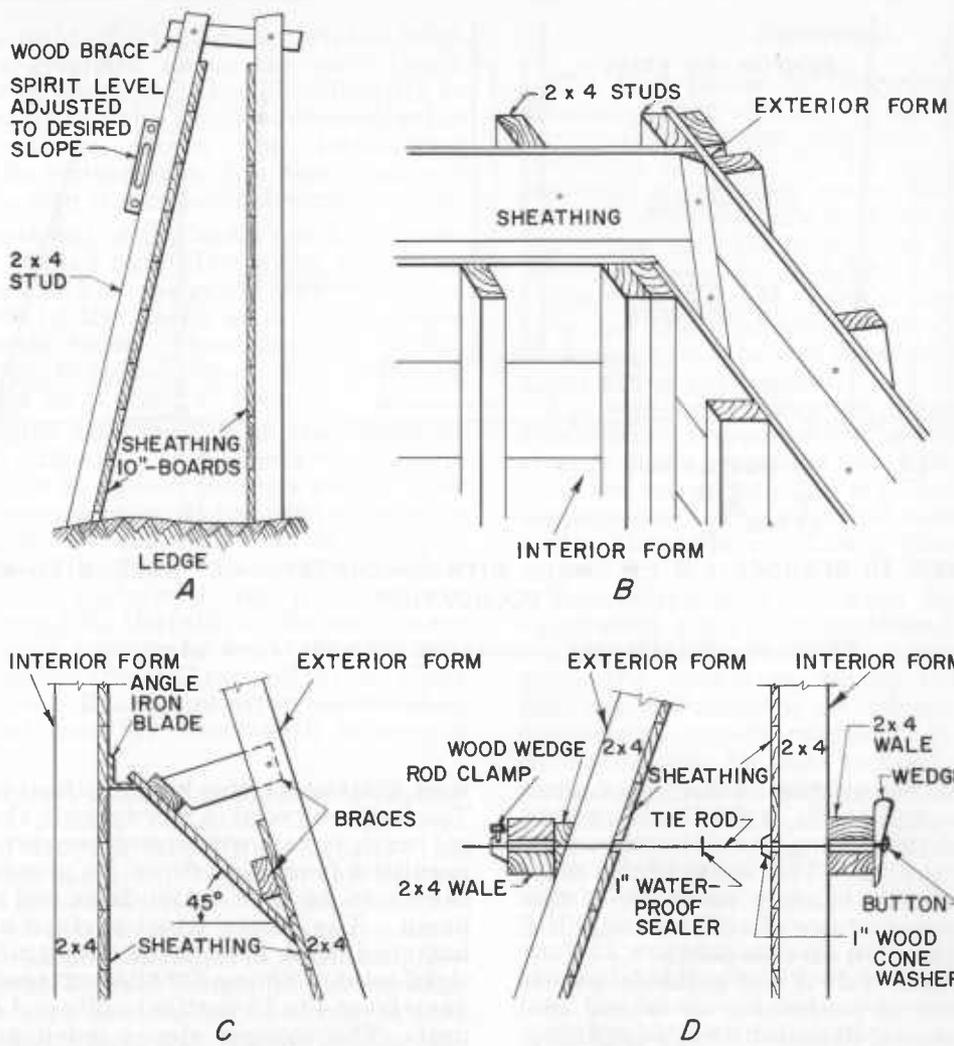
Plans for constructing forms for concrete walls for weir at Hubbard Brook Experimental Forest, West Thornton, N.H.: A, cross section of wall forms; B, top view of corner arrangement of wall forms; C, cross section of wall at the sloping section where blade is attached; D, details of tie-rod arrangement for bracing wall forms.
